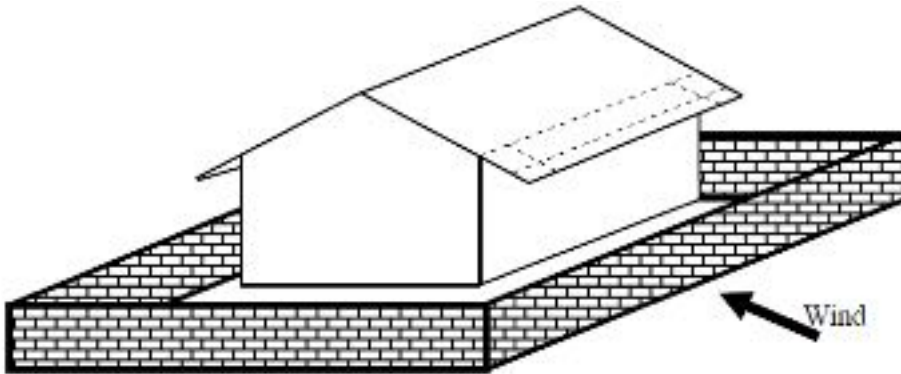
5: A sketch for a gable roof building with overhang surrounded by boundary wall (John et al. 2008)
